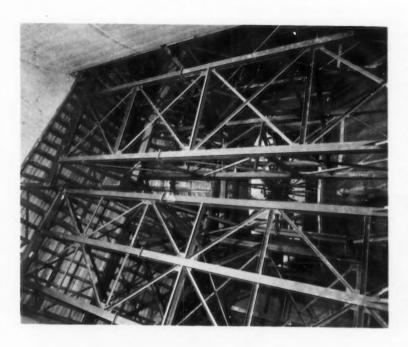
STRUCTURAL STEEL SHORING AND WOOD SHEATHED STEEL RIB FORMS
